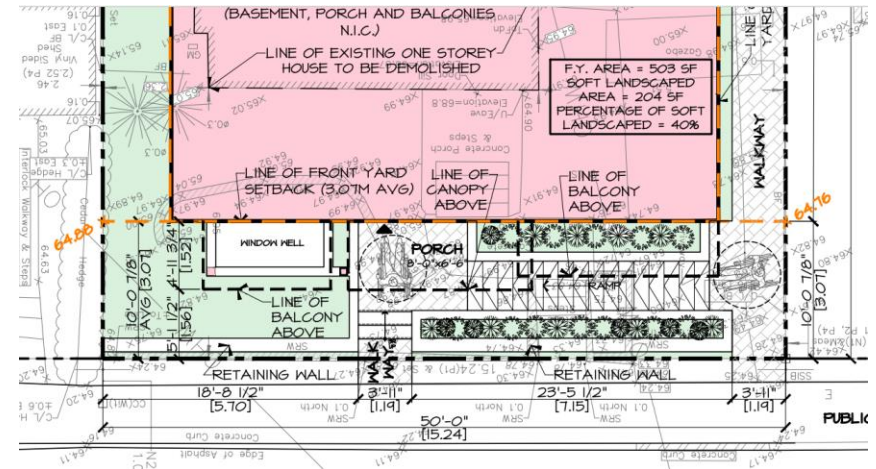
Excerpt from Site Plan Illustrated Front Entry and Landscaping
